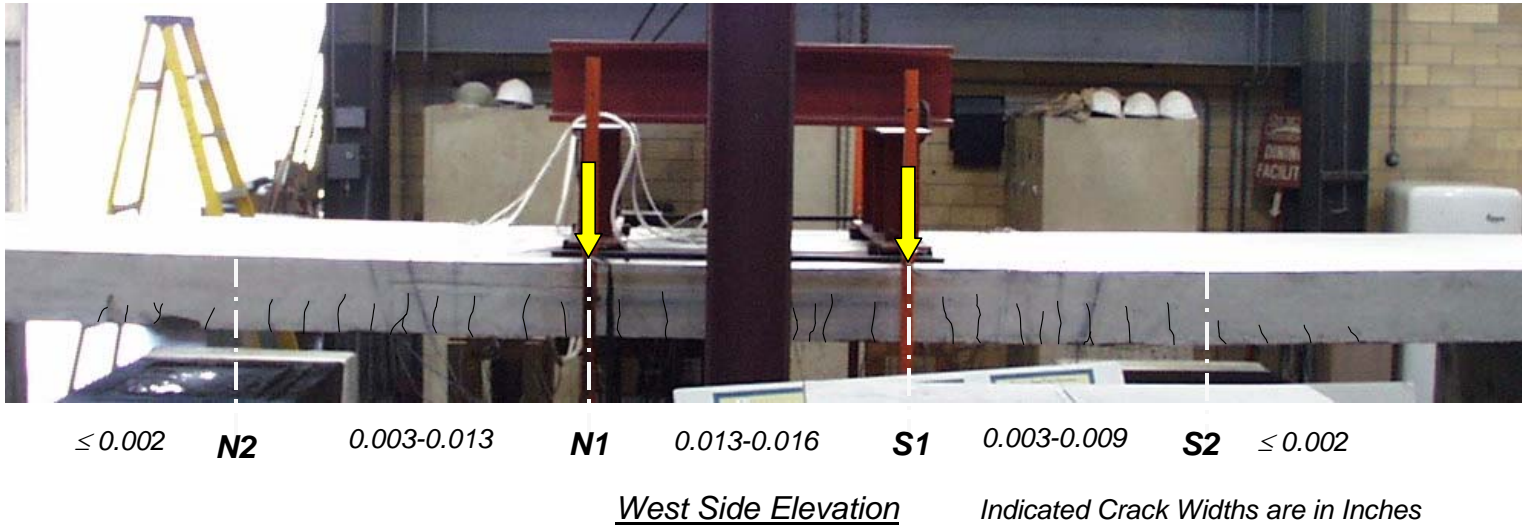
Cracking Pattern of Specimen FS-1 at Load Stage 2 (34 kip)
